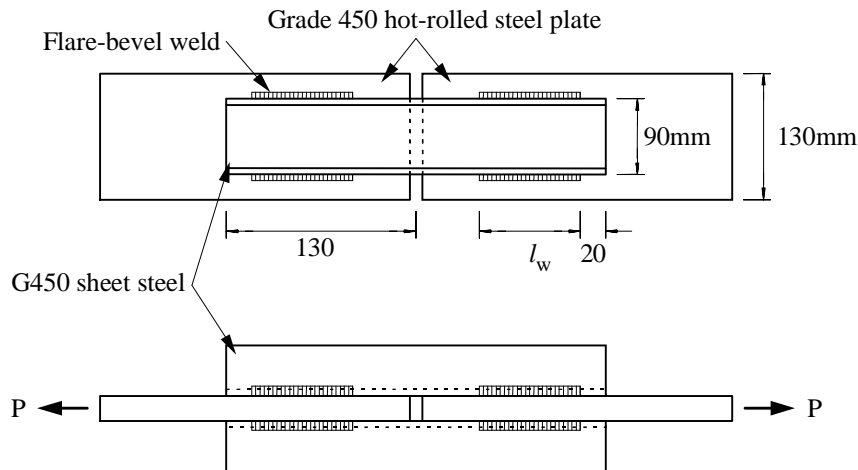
Double-lap longitudinal flare-bevel welded connection specimen
